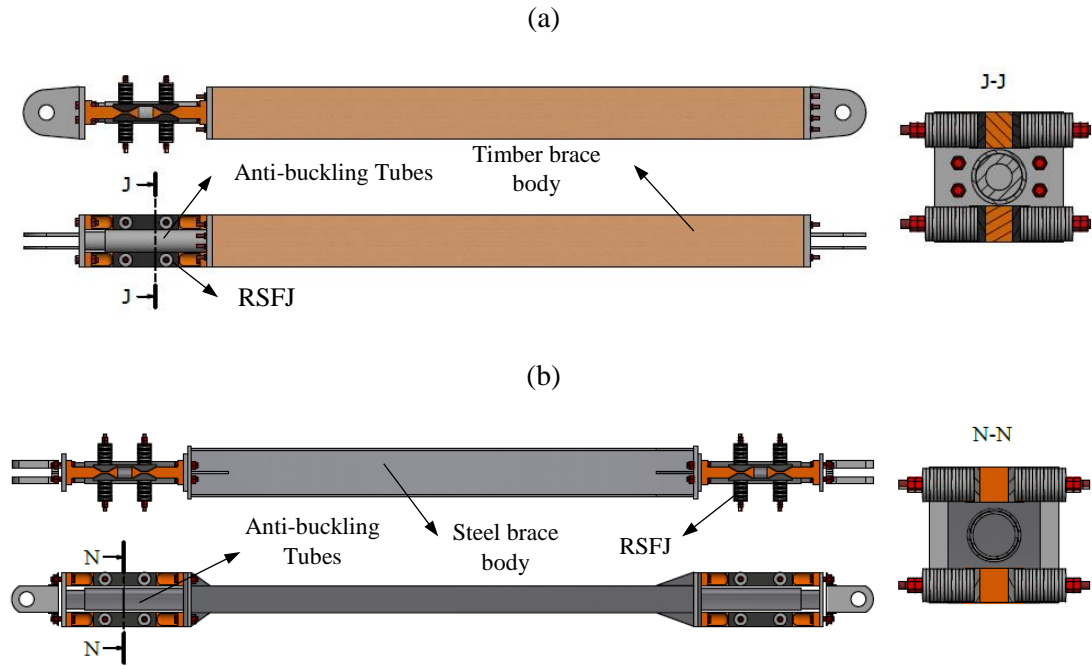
(a) RSFJ brace with one damper and timber brace body [165], (b) RSFJ brace with two dampers and steel body
